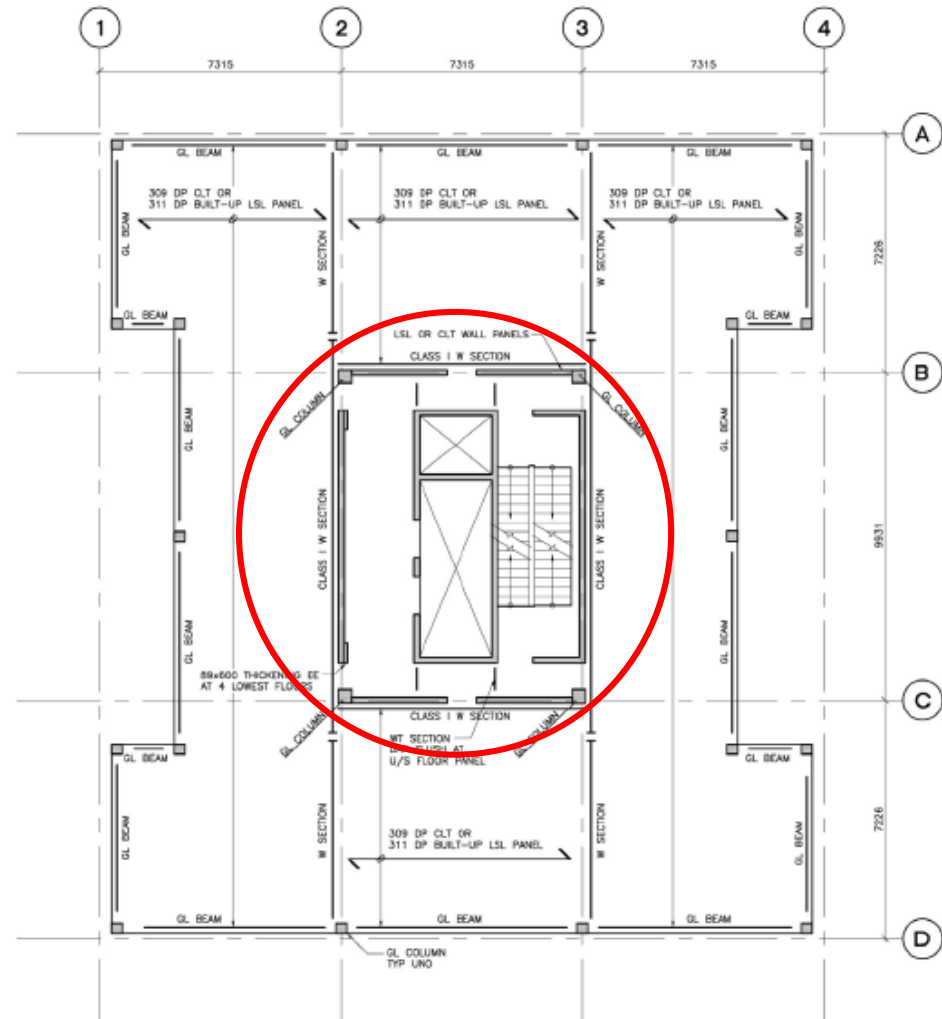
Typical plan view showing the shear walls of the lateral-load resisting system.
